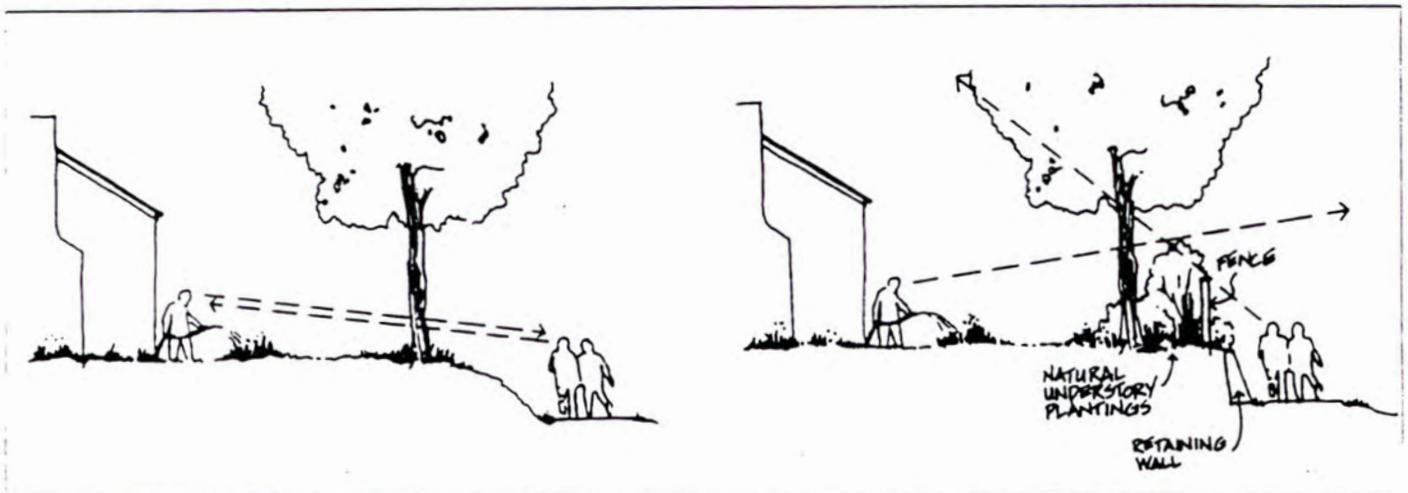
TYPICAL TRAIL CROSS SECTION
